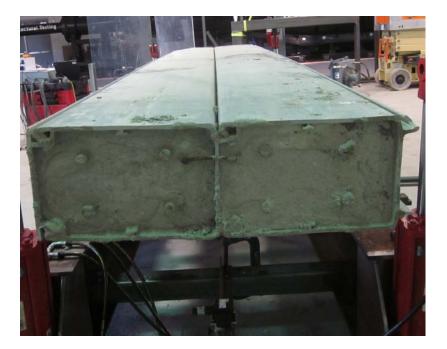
End View of 12'' Thick Specimen (Series 1200)
